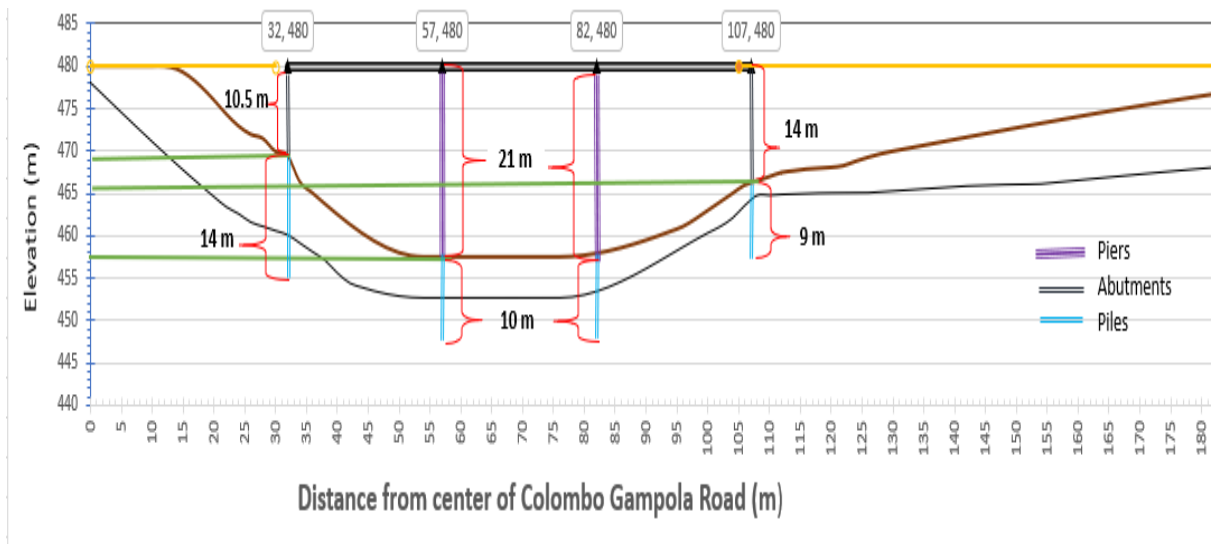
Longitudinal profile of the proposed bridge with heights of piers, piles and abutments
